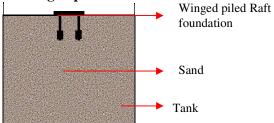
Installation of winged piled raft foundation After filling the tank with sand, the winged piled raft foundation is directly driven and then the load is applied.
